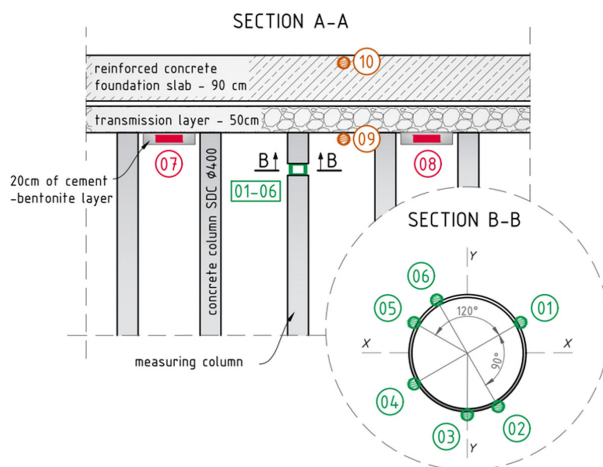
SHM system scheme: side view and force gauge cross section (own elaboration)
